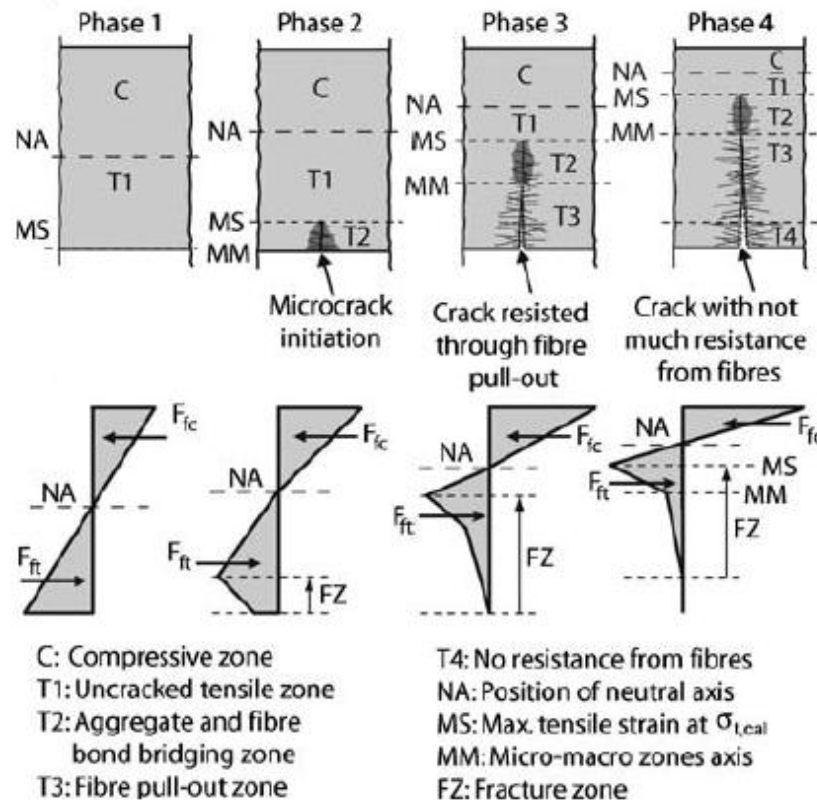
Schematic representation of a steel fibre reinforced concrete beam under flexural loading (Tlemat *et al.*, 2006)
